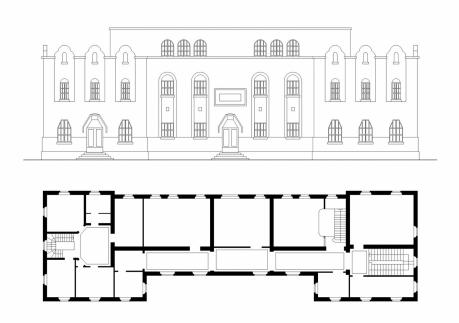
The first floor plan and façade of the School for Boys in Kos.
